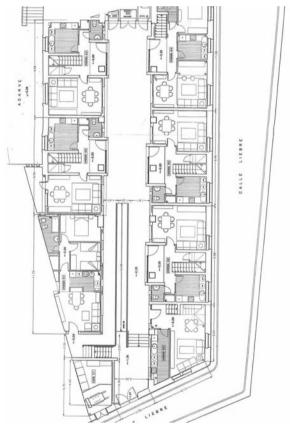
Floor plan of the bodega on 11, Liebre st after its transformation (Sánchez, 2014, 29).
